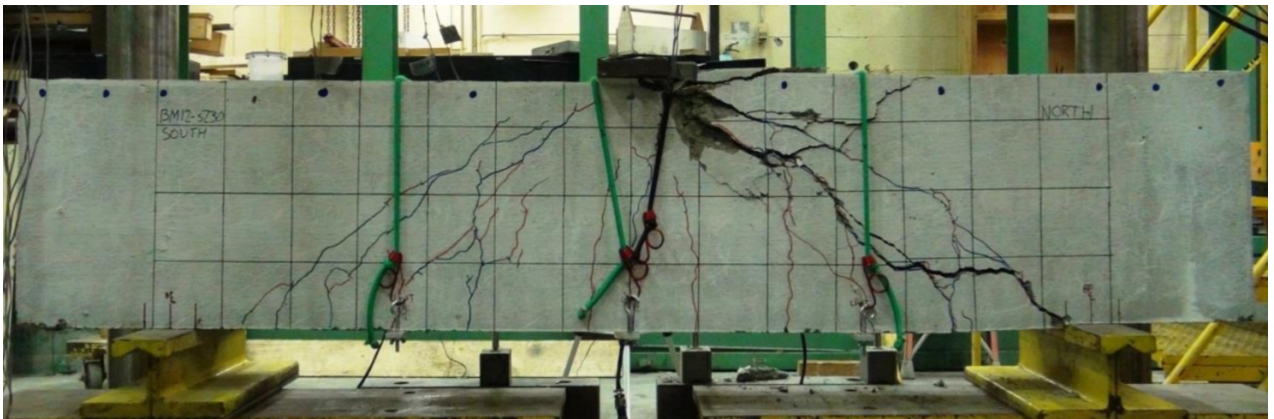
Typical Failure Mode for Beams with Stirrups
